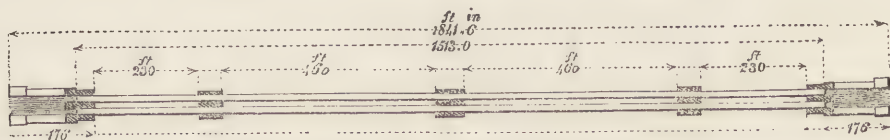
PLAN OF THE BRITANNIA TUBULAR BRIDGE.
